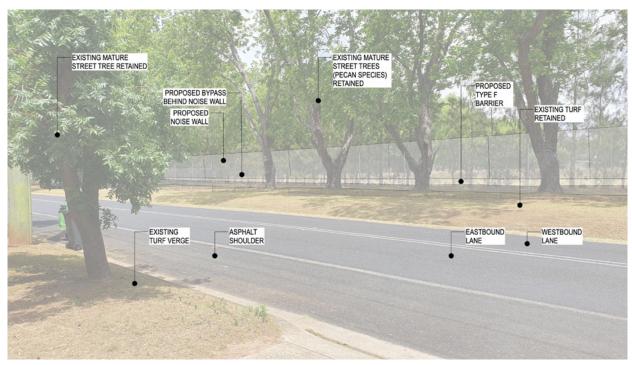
Viewpoint 10 - Proposed view from edge of Southee Road looking south east towards the Londonderry Road
